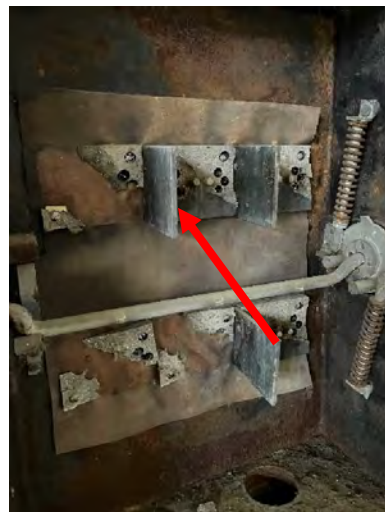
HA 34: Asbestos-Containing Cementitious Panels
